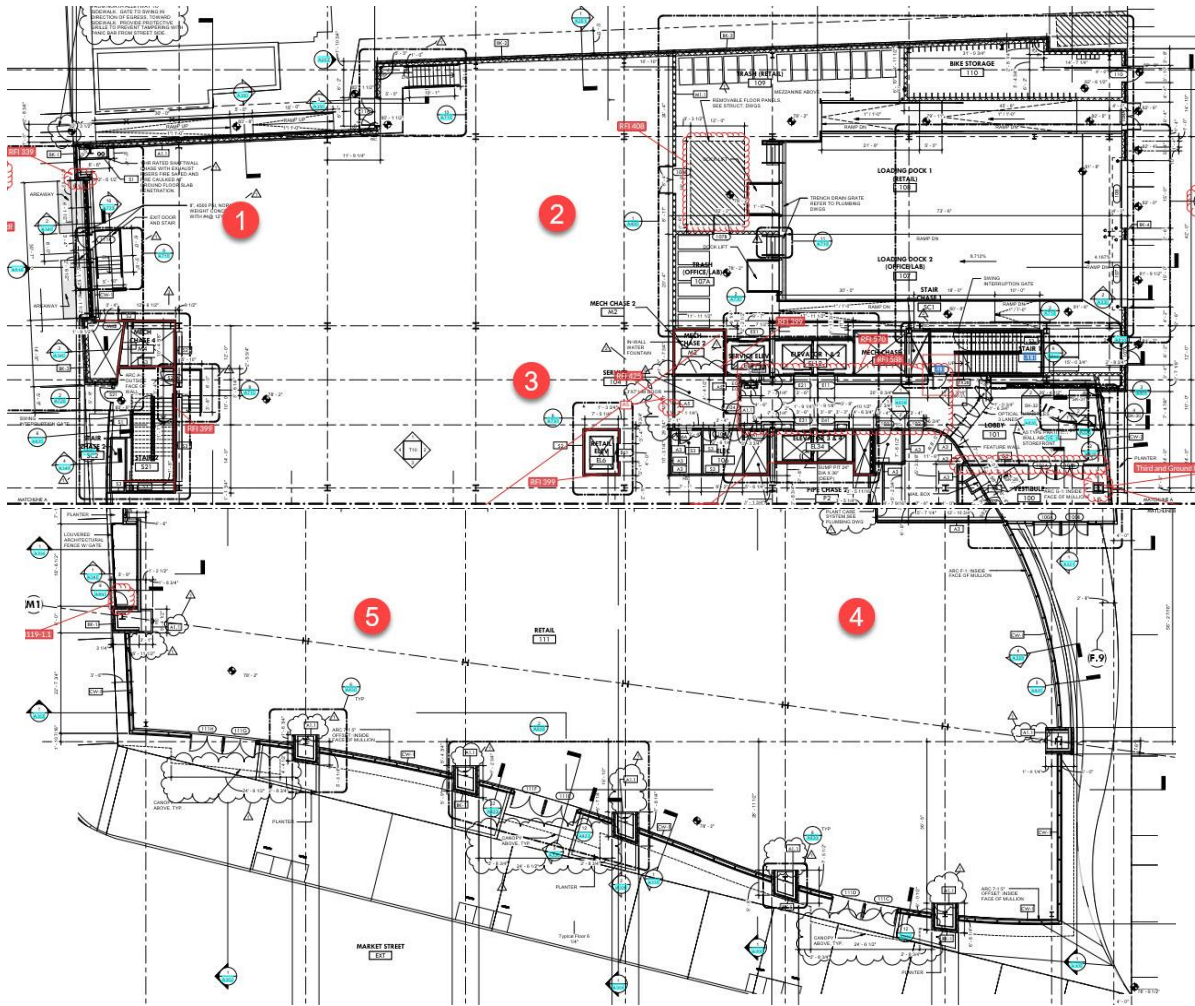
Node positions, 1<sup>st</sup> floor - 5/5/2023 to 5/8/2023
